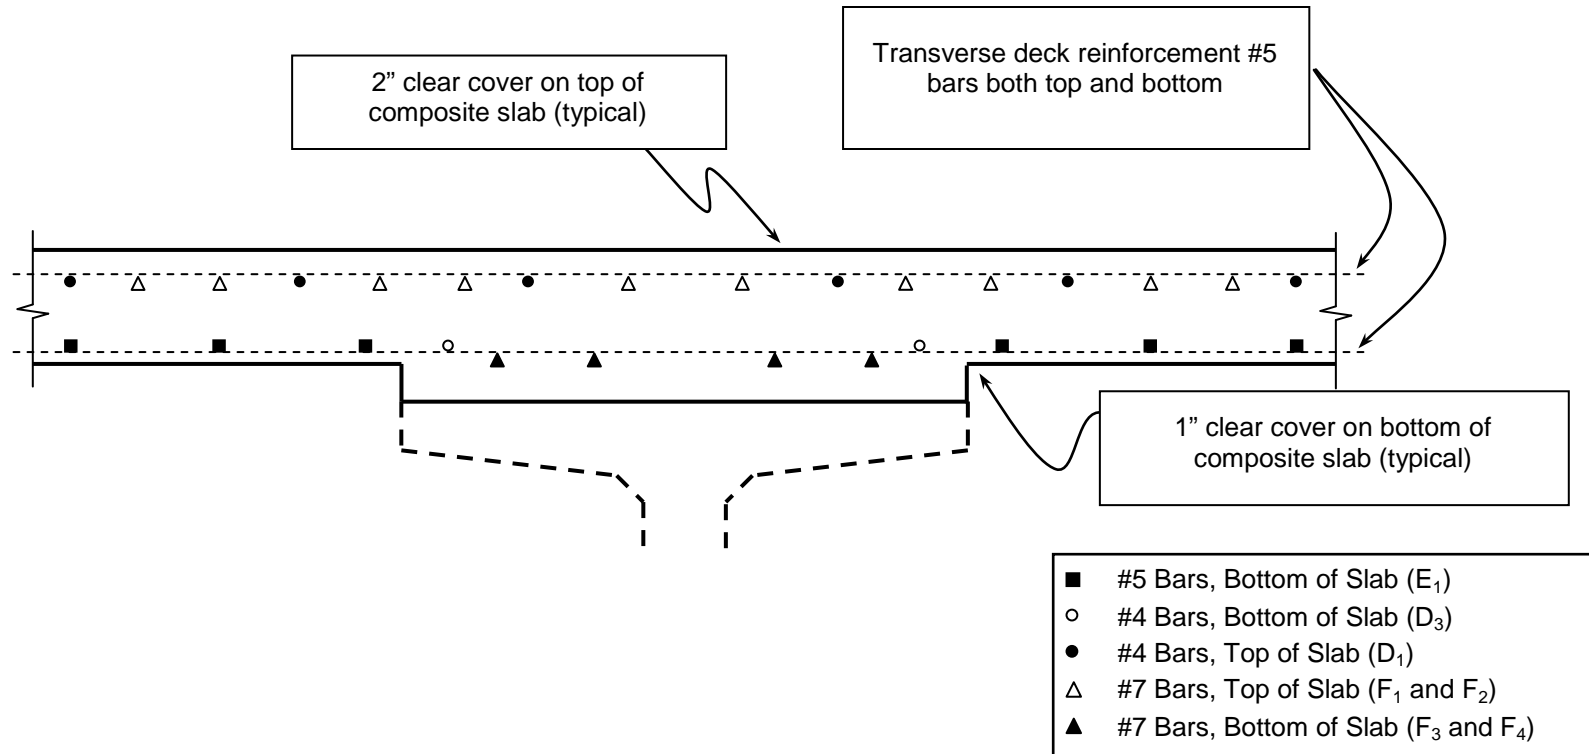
Cross section view of deck slab reinforcement over an interior girder (ALDOT 1988; Swenson 2003)
